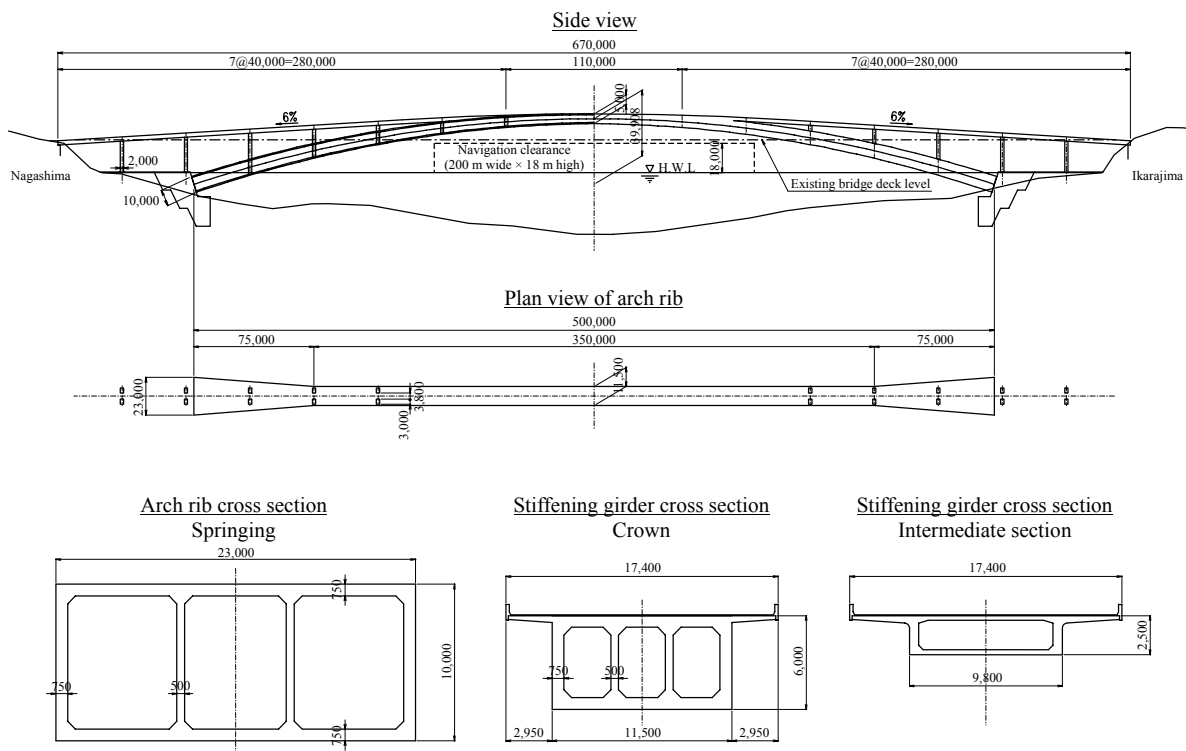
Proposed design of Ikara Bridge (arch bridge)
